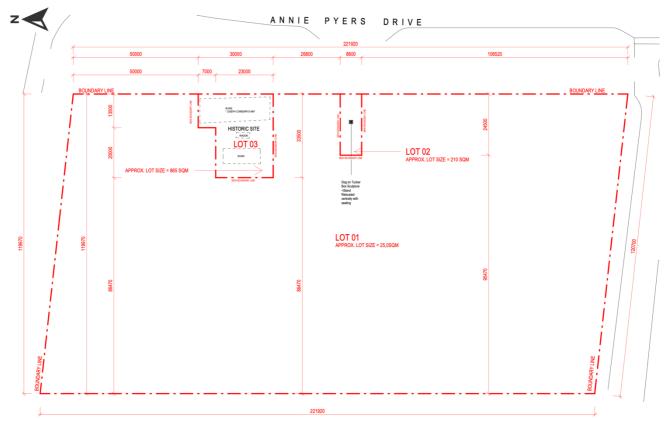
Extract from the architectural drawings showing proposed subdivision layout
